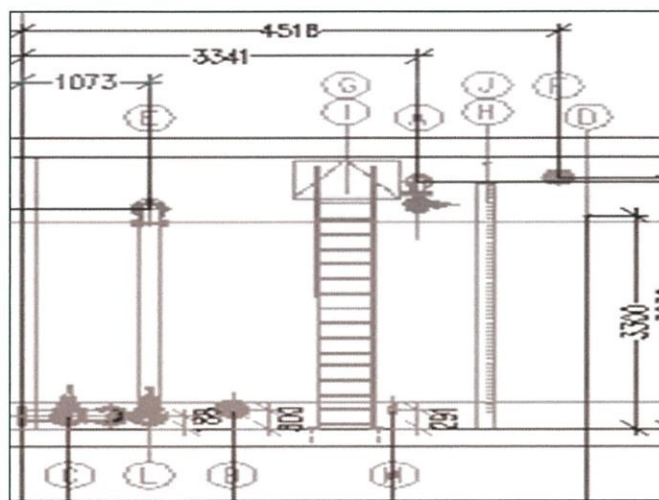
Shop drawing of ladder (source: Tetuan Yeo Plumber Sdn Bhd)
